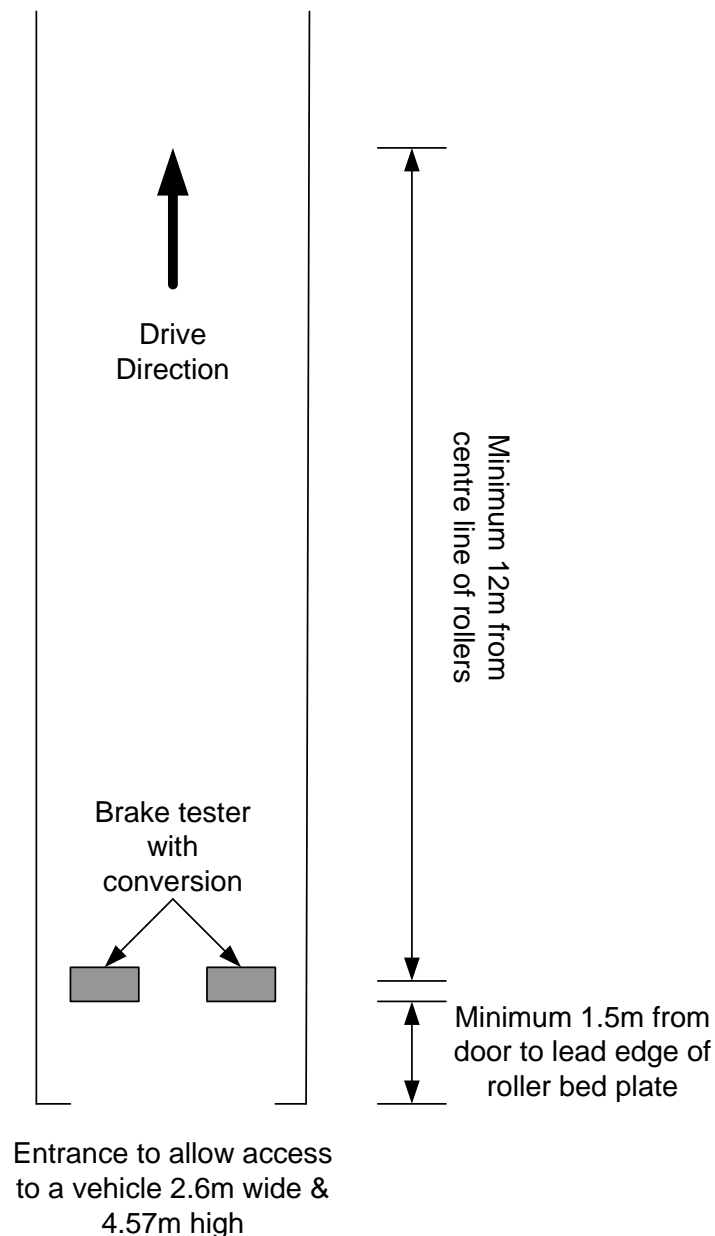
Minimum dimensions required for a flat bay incorporating a Brake Roller Tester (RBT) with tachograph conversion – with no pit
